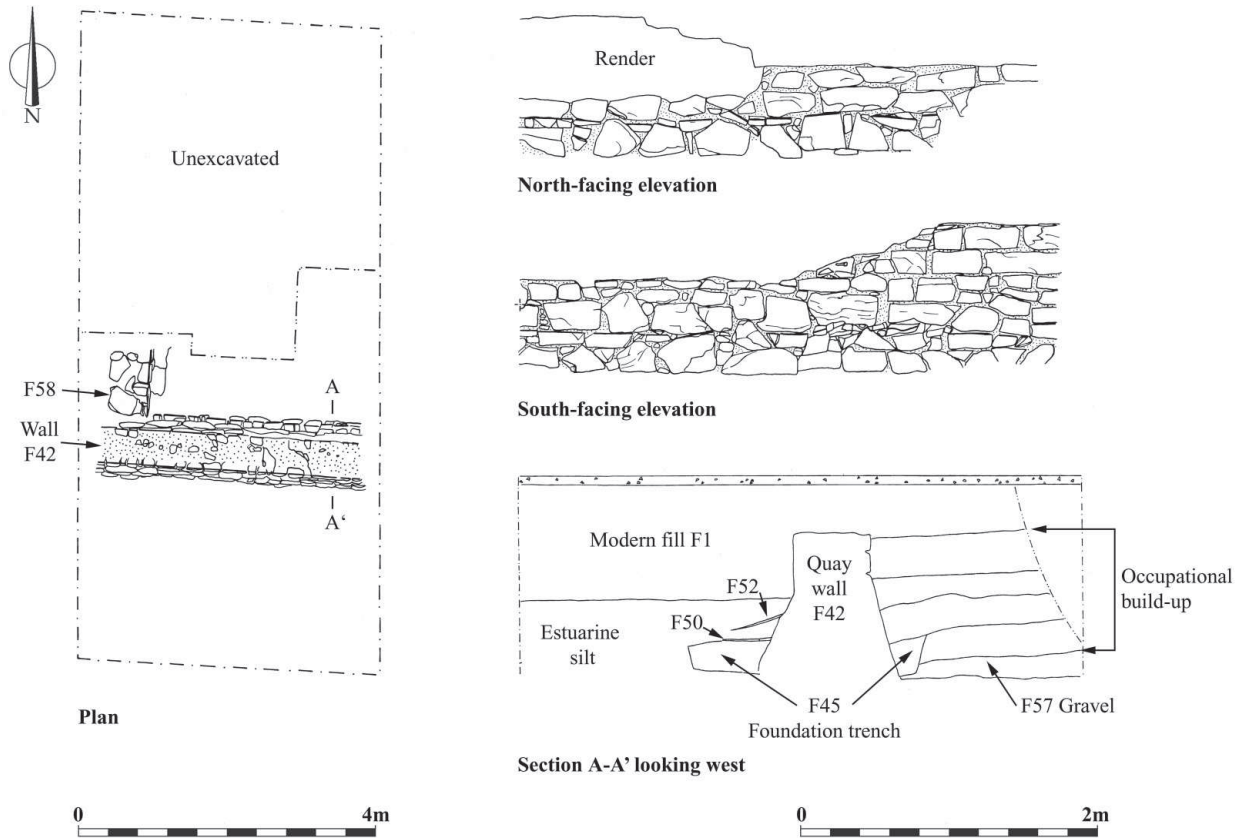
Red Abbey Yards, Trench 4 – plan, elevation and section of eighteenth-century wall (F42)
